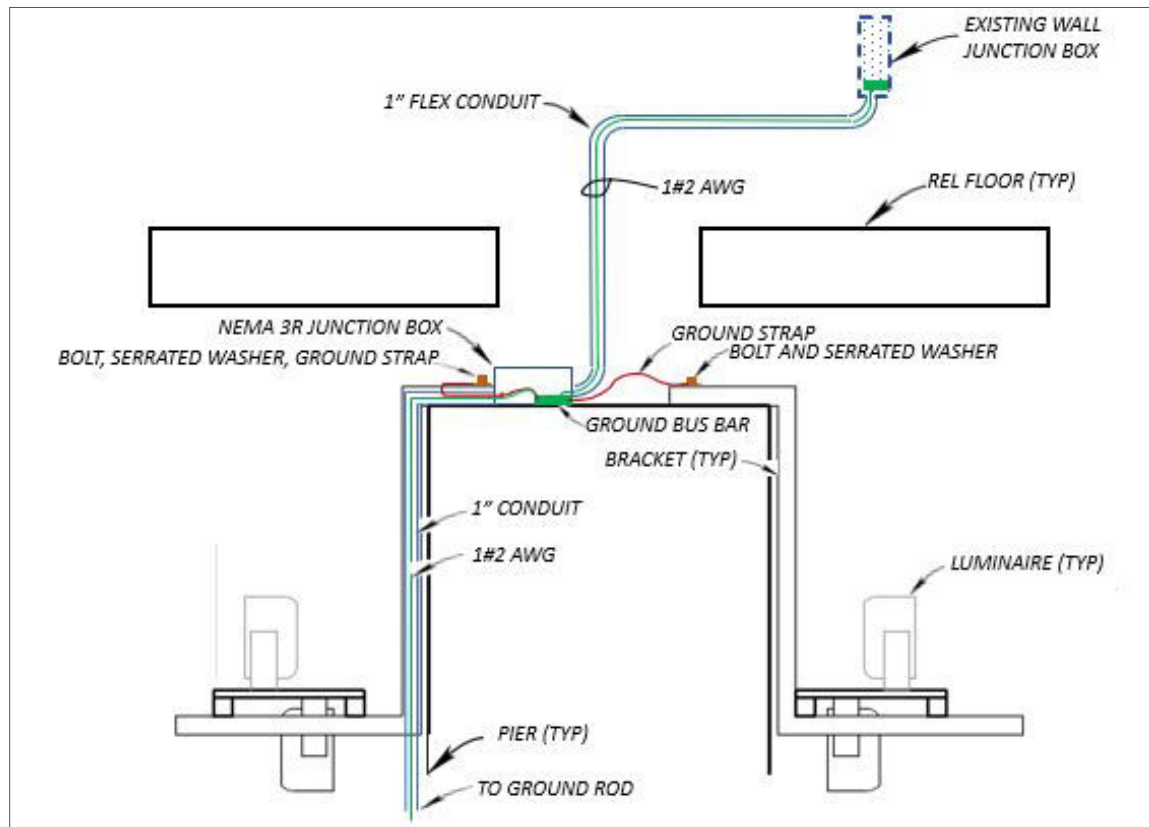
GROUND WIRE ROUTING PLAN VIEW
